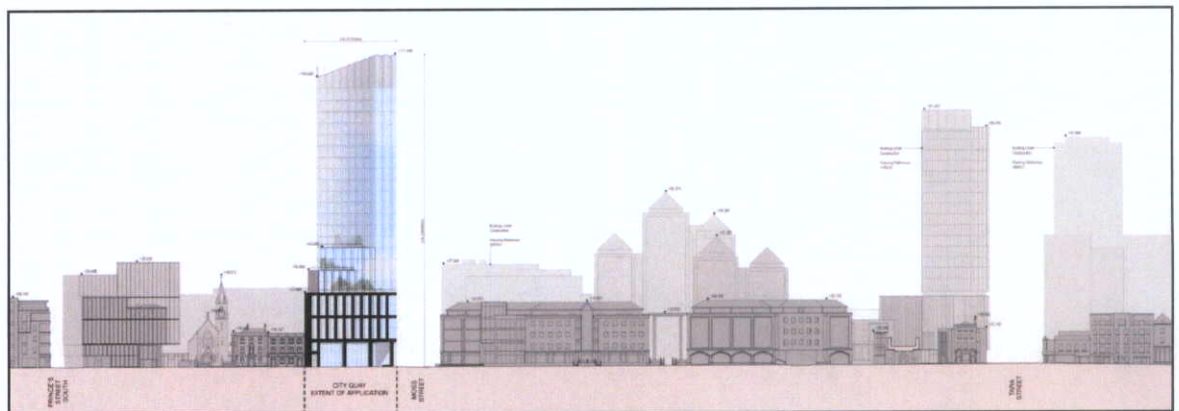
North Elevation (Mahoney Architecture 2022)
